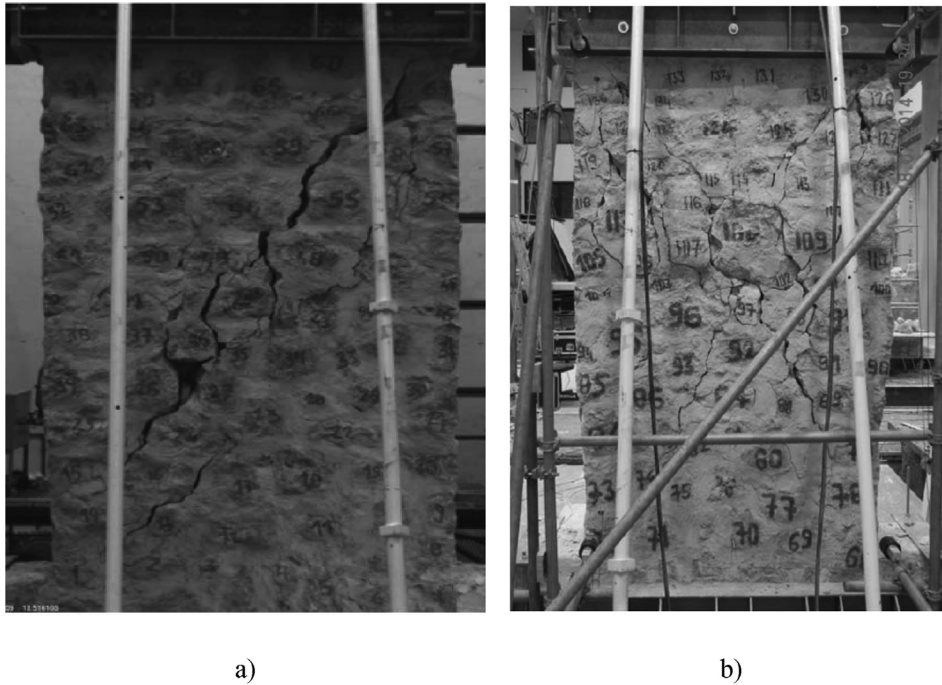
Failure modes for the experimental walls: a) Wall 1; b) Wall 2.
